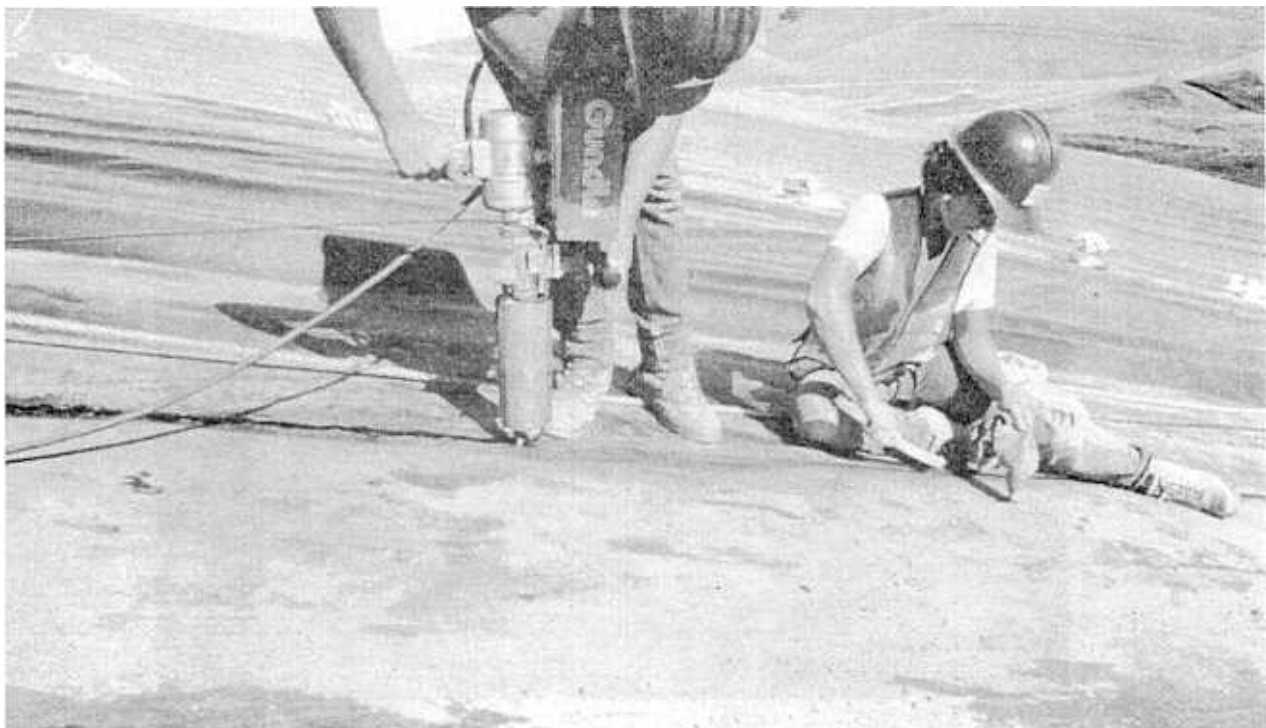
Field seaming geomembrane using a hot-extruded fillet weld. Worker at right is cleaning and wire brushing overlapped area to be seamed.
